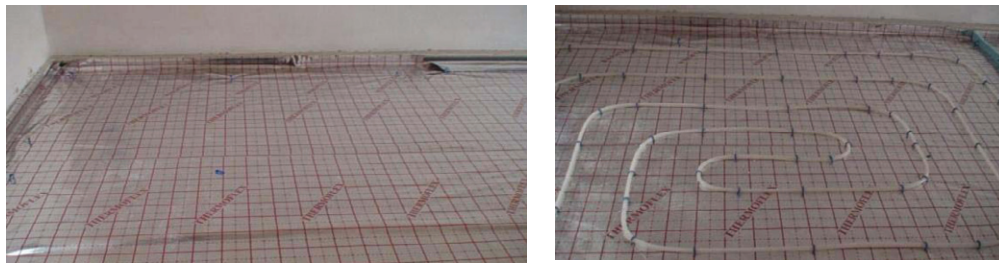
(c) thermal reflectors ; (d) floor heating pipes
